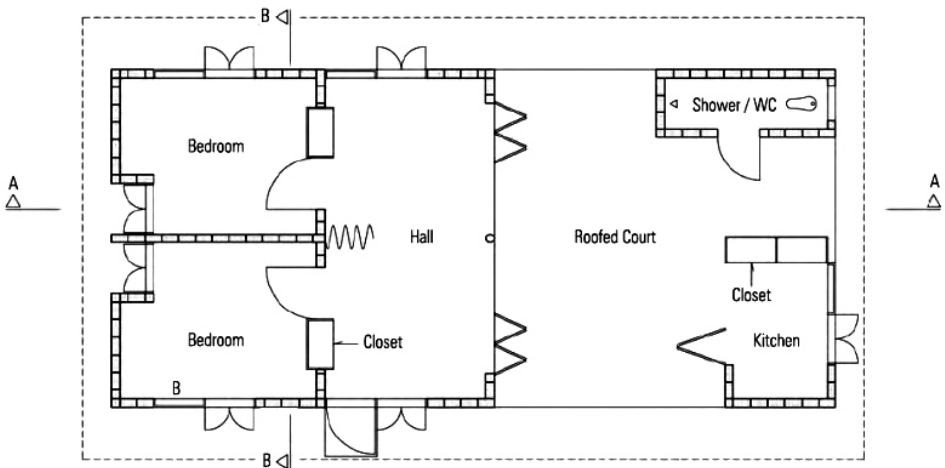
The Kirinda House's floor plan, <http://www.architectureindevelopment.org/project.php?id=43>, (entry: 27.08.2014)
